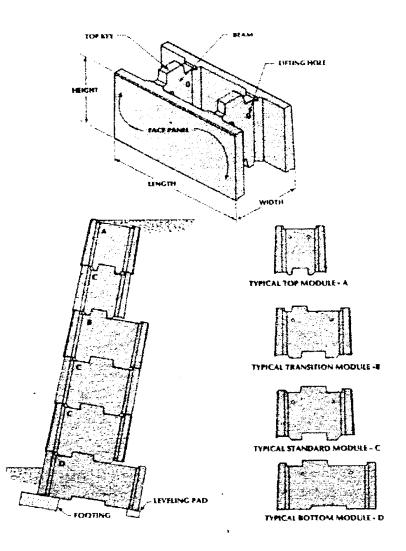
MODULAR RETAINING WALLS ("DOUBLEWAL")
